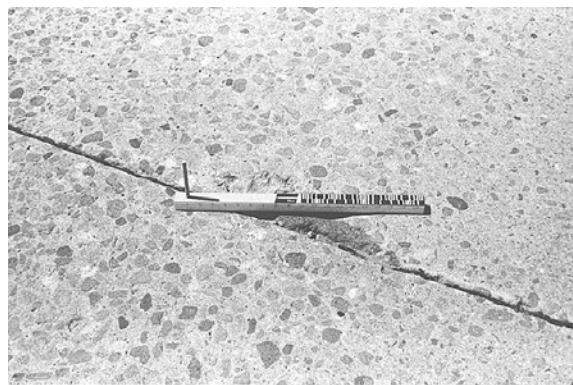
JOINT SPALLING AT A TRANSVERSE JOINT
